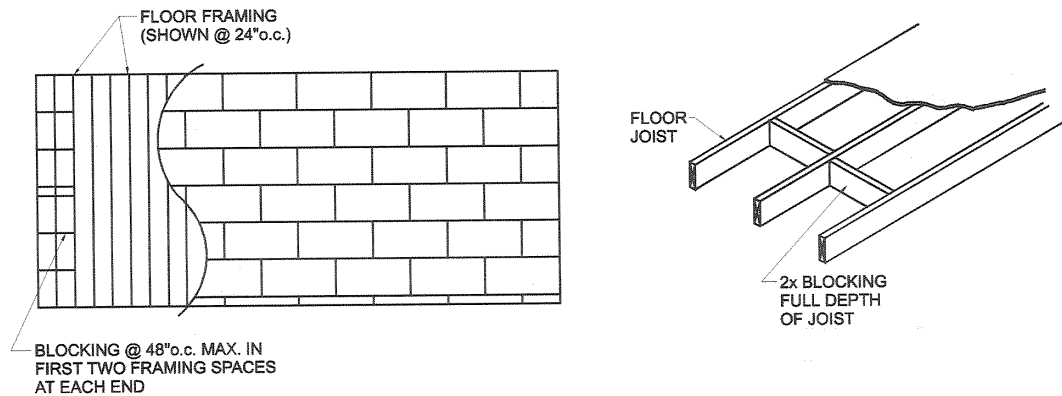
Required blocking of floor joists for wood frame floors (SSTD 10-99).
